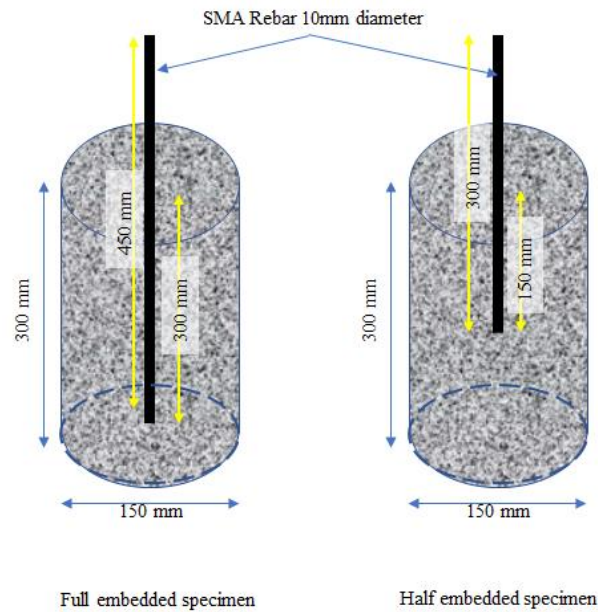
Schematic diagram of rebars (length 450 and 300mm) embedded in concrete specimens
